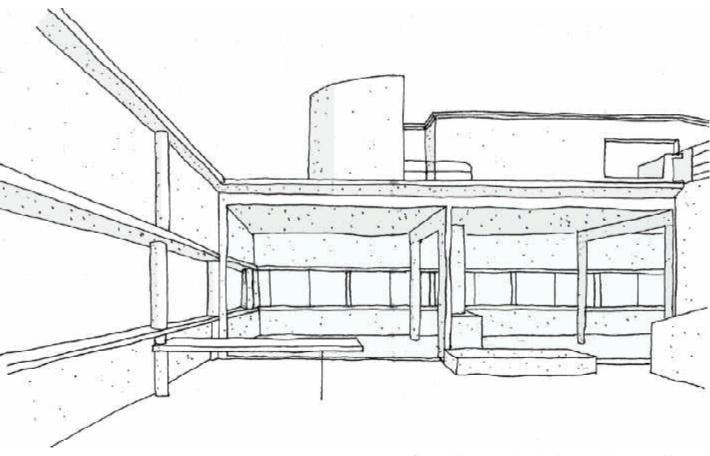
Sketch perspective of roof garden looking towards living room.
